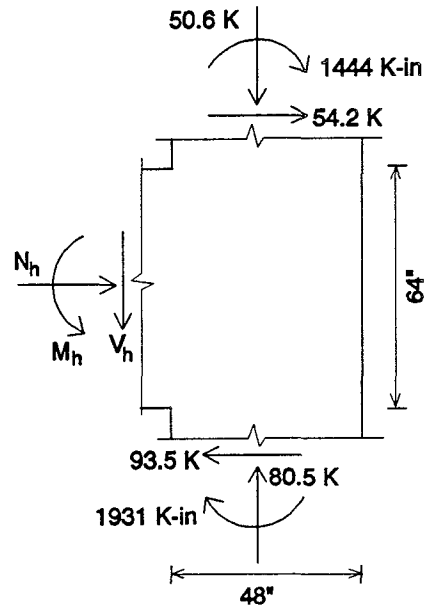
Forces acting on 2nd floor horizontal member-pier connection of Specimen 1a
